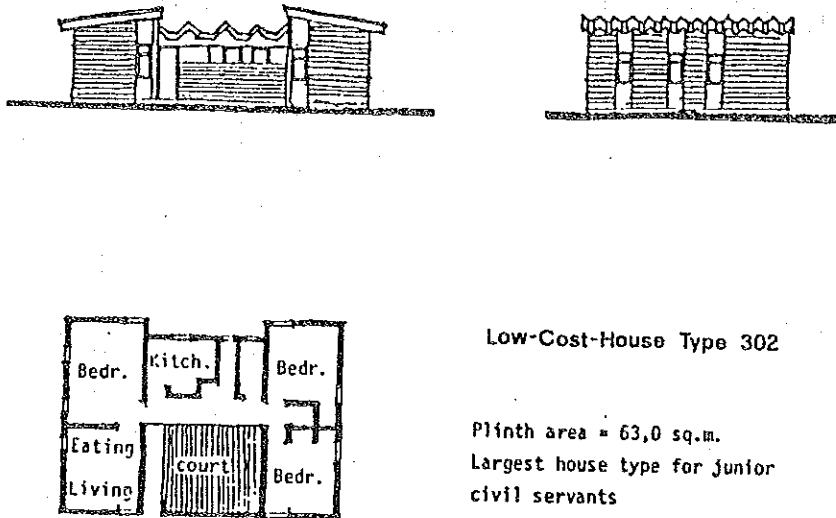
Typical Plan of Low-cost Formal-sector House
